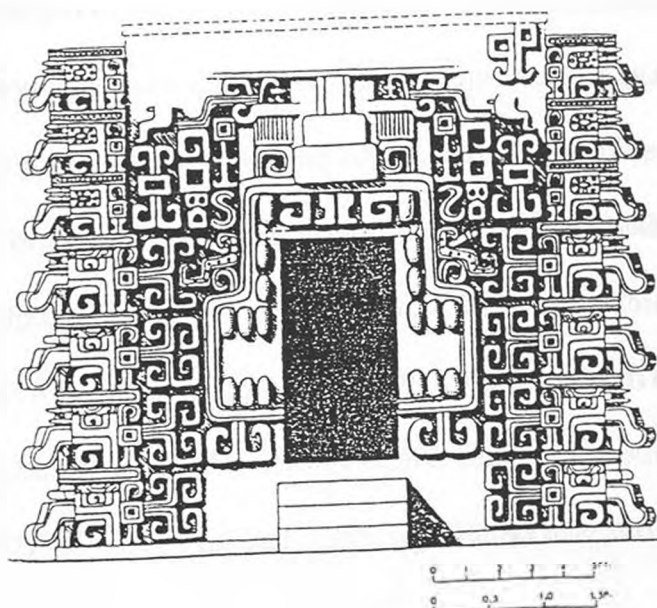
Hormiguero, Str. V- Detail of north facade masks (G. Andrews 1988).
